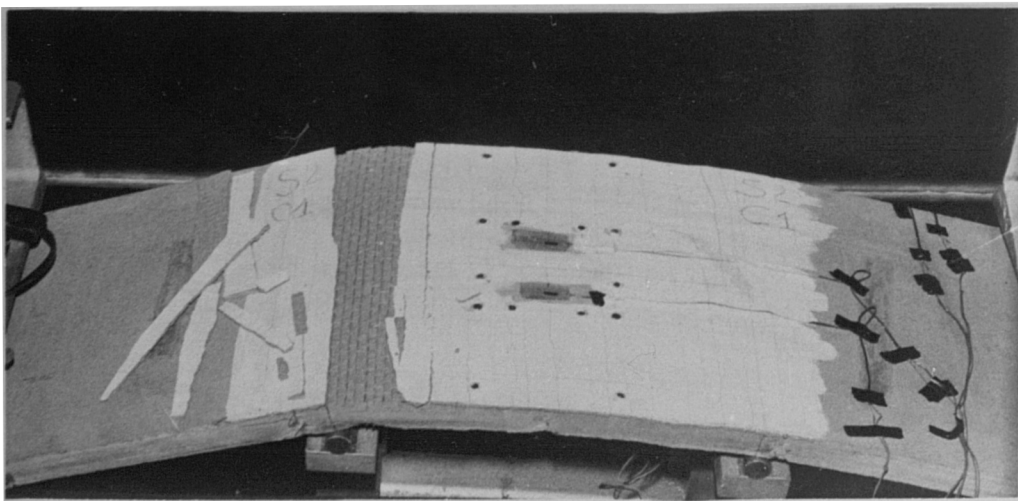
Specimen failed by fracture of wire mesh in tensile zone.
